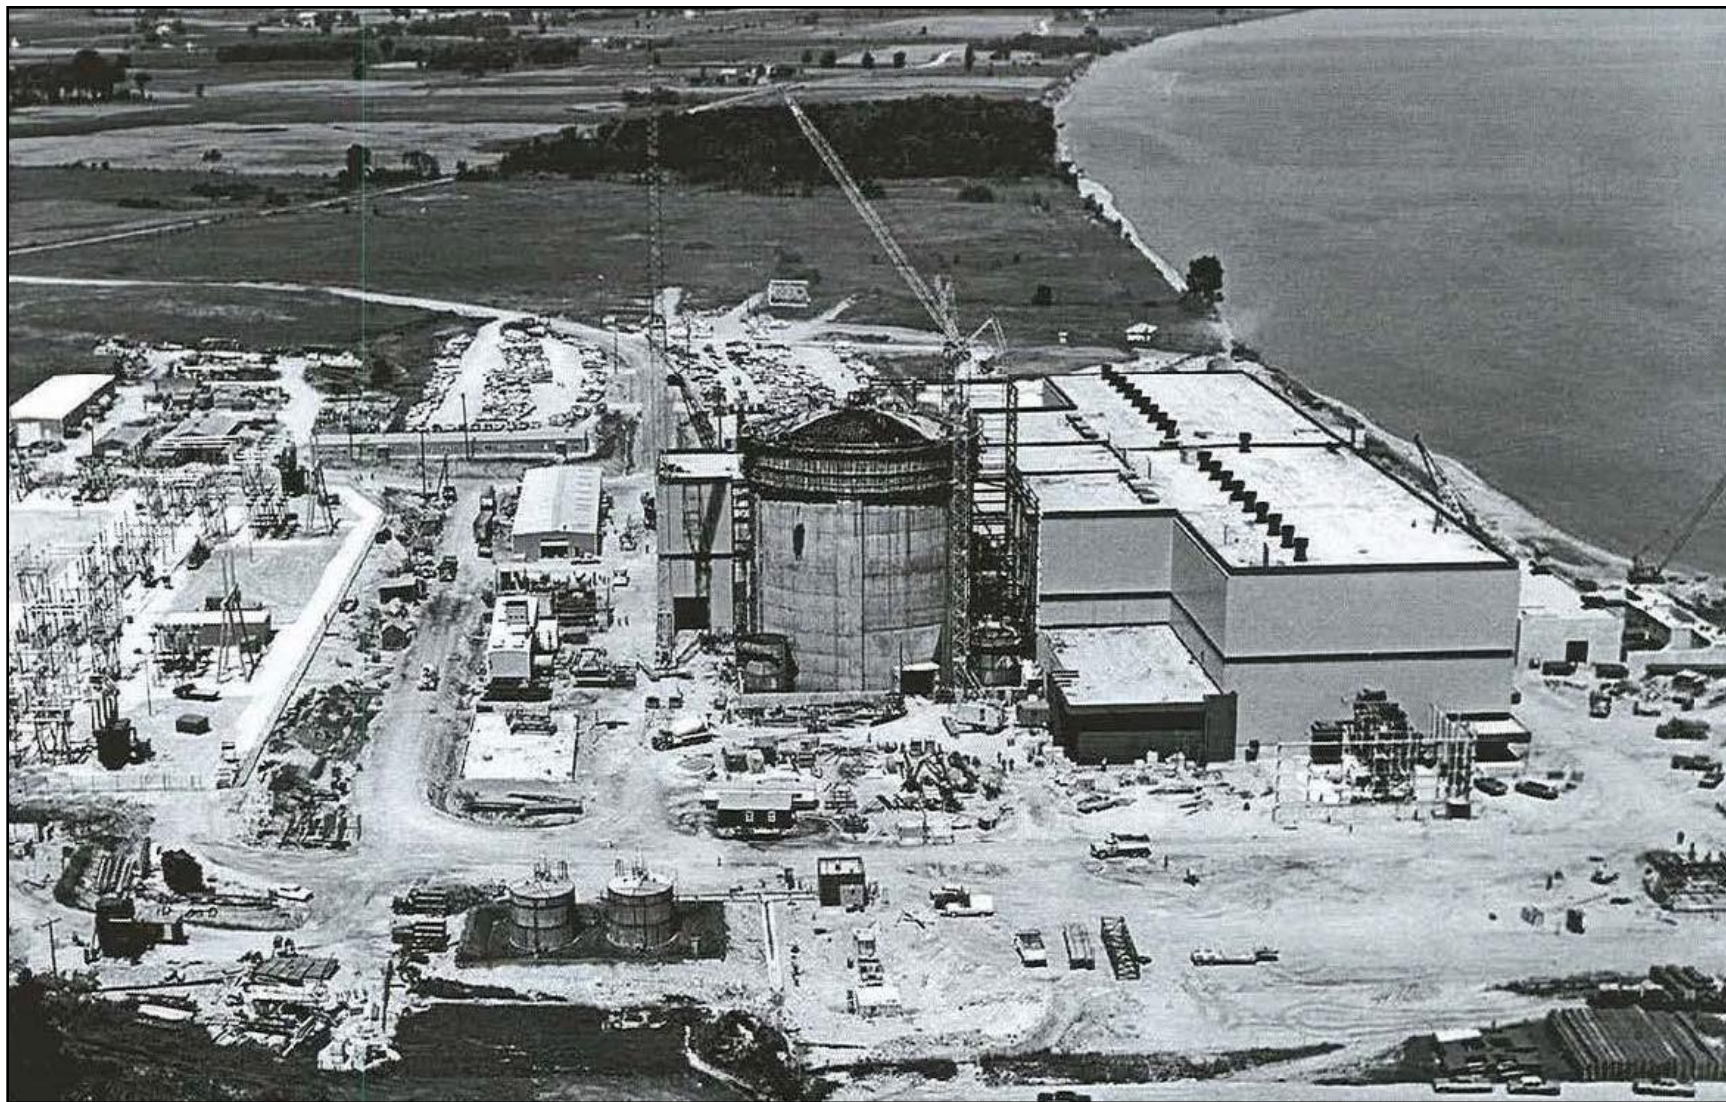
Construction Photograph of the PBN Site, August 1969
